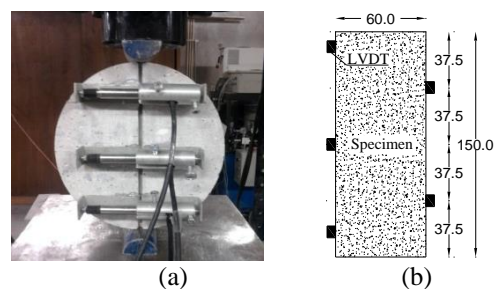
Geometry of the specimen and setup of the splitting tensile test (dimensions are in mm): (a) specimen front view (top of the panel), (b) specimen lateral view.
